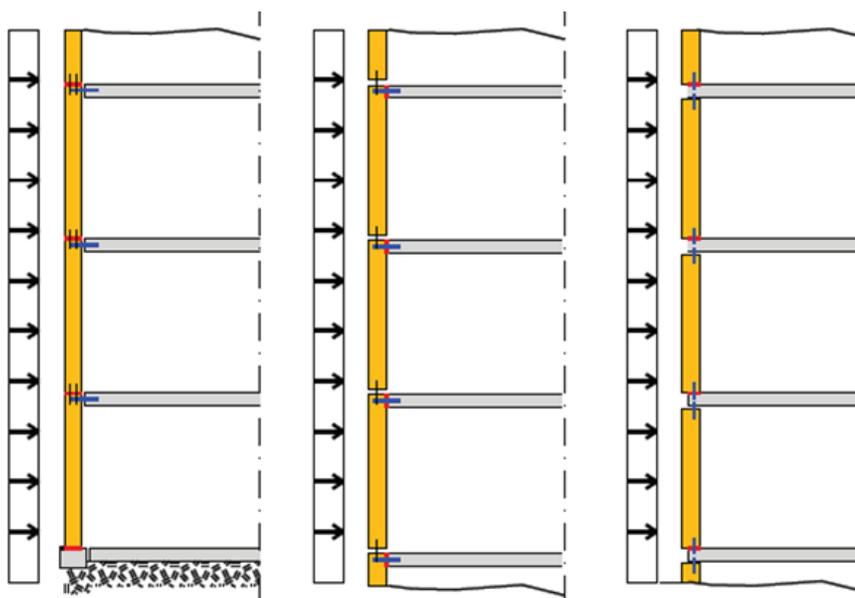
Principles of highly-insulated timber-frame elements related to reinforced concrete structures, outside supporting below (left) and on top (centre), partly or fully integrated (right)
